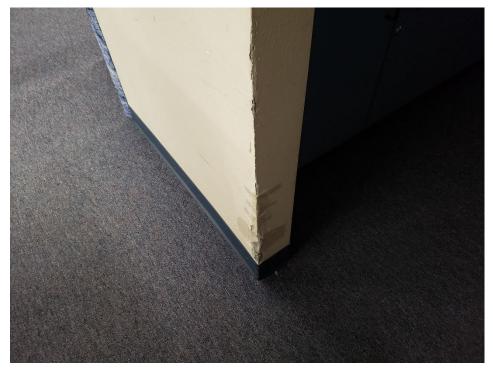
Damaged Joint Compound at Wall Edge in Media Center
